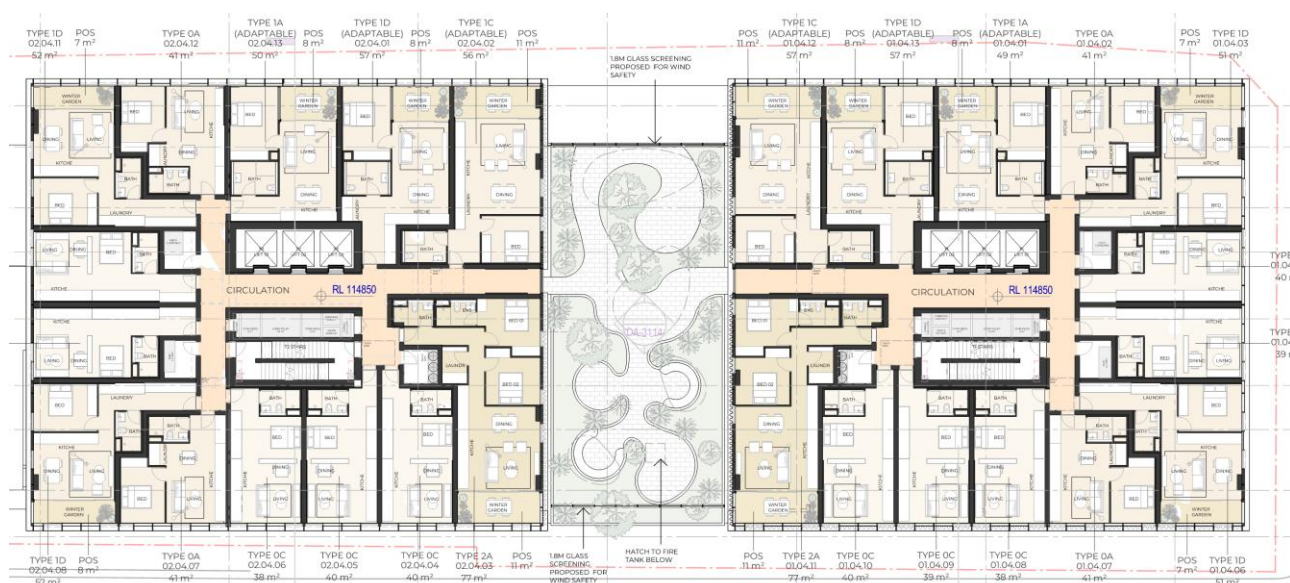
Exert of proposed amendment to Level 4 Plan (Source: Woods Bagot)
